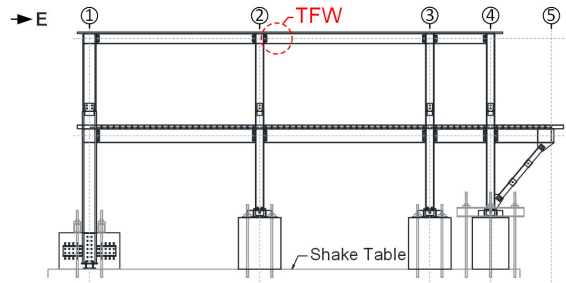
After Test 2B-3: Bolt Slippage at Roof East-Side TFW Connections
